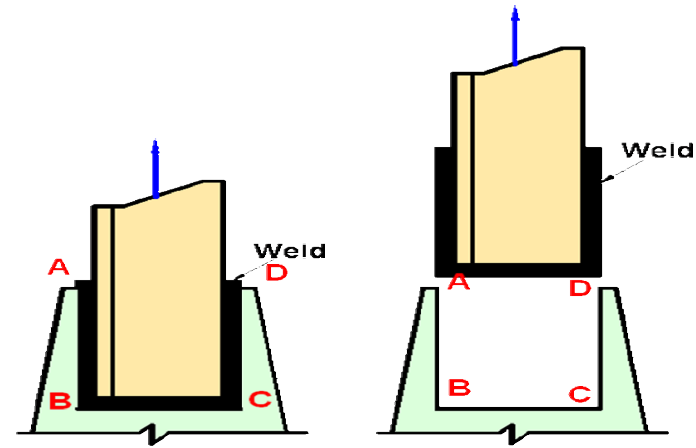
Block shear failure of gusset plate in welded connections
